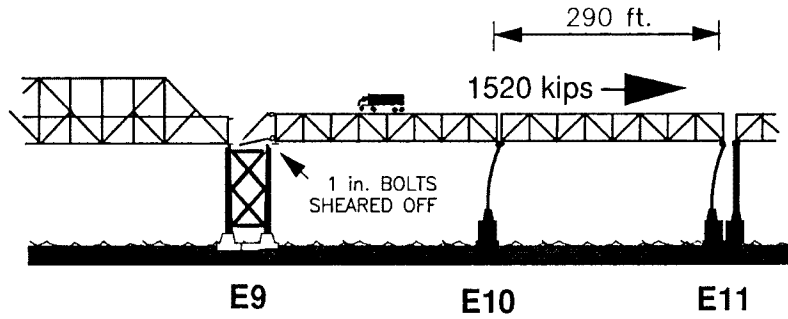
Collapse of upper and lower decks of Bay Bridge (piers E9 to E11 segment)<sup>28)</sup>.
